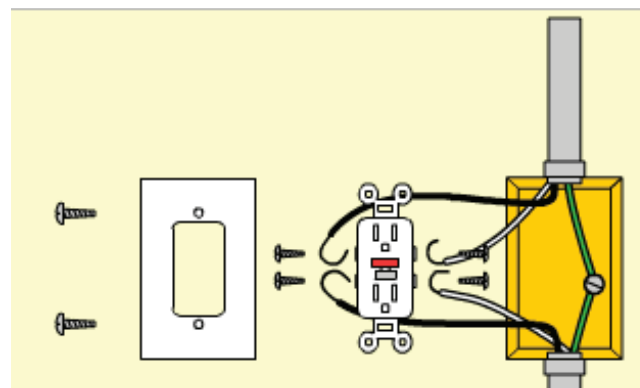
Typical Ground Fault Interrupt receptacle.
